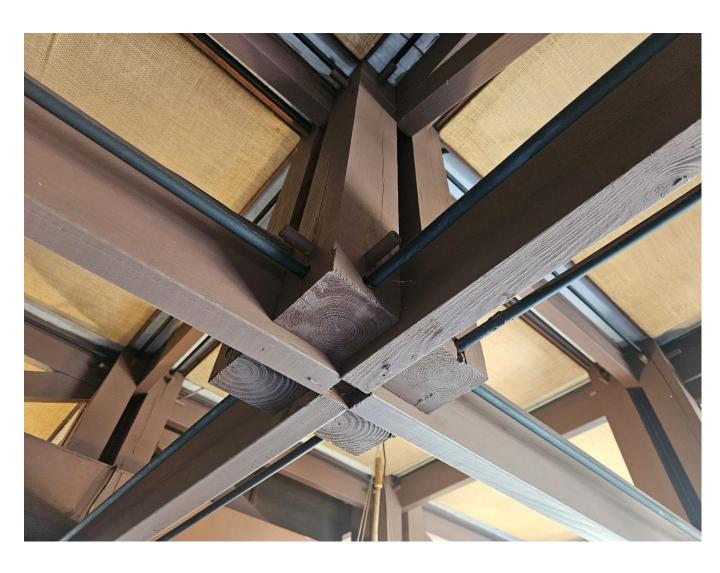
Detail view showing a typical connection point in the wood spaceframe roof structure in the main living area on the northeast side of the building.
